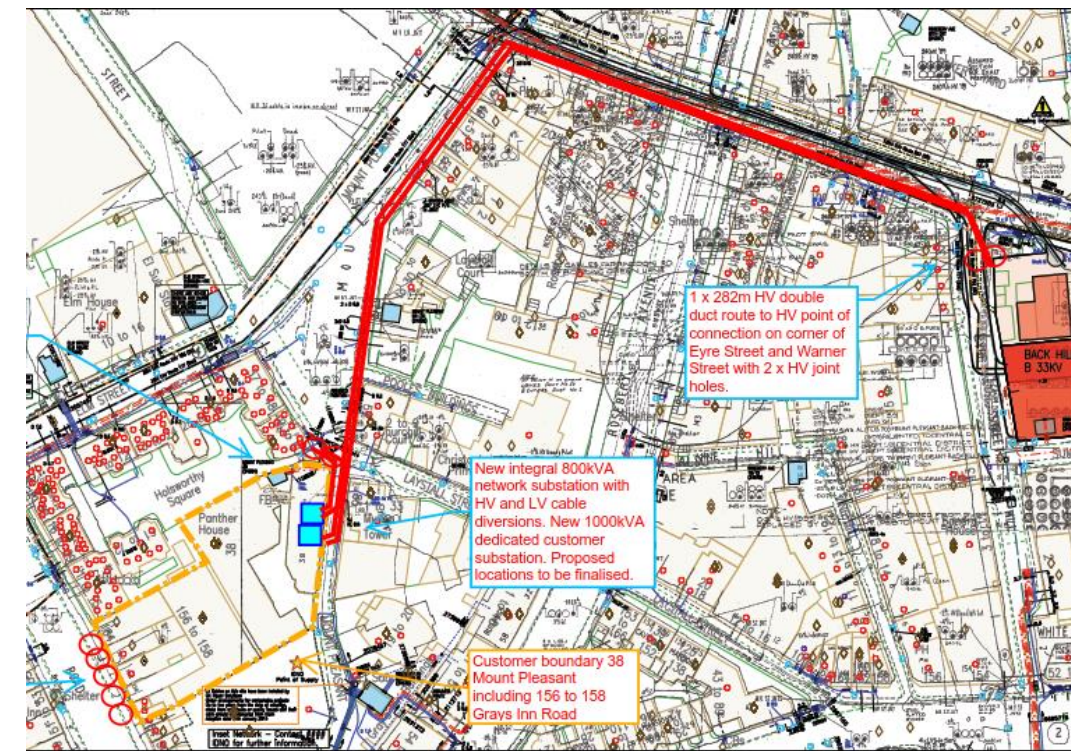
Proposed HV Cable Route from the local Back Hill 33kV Substation
